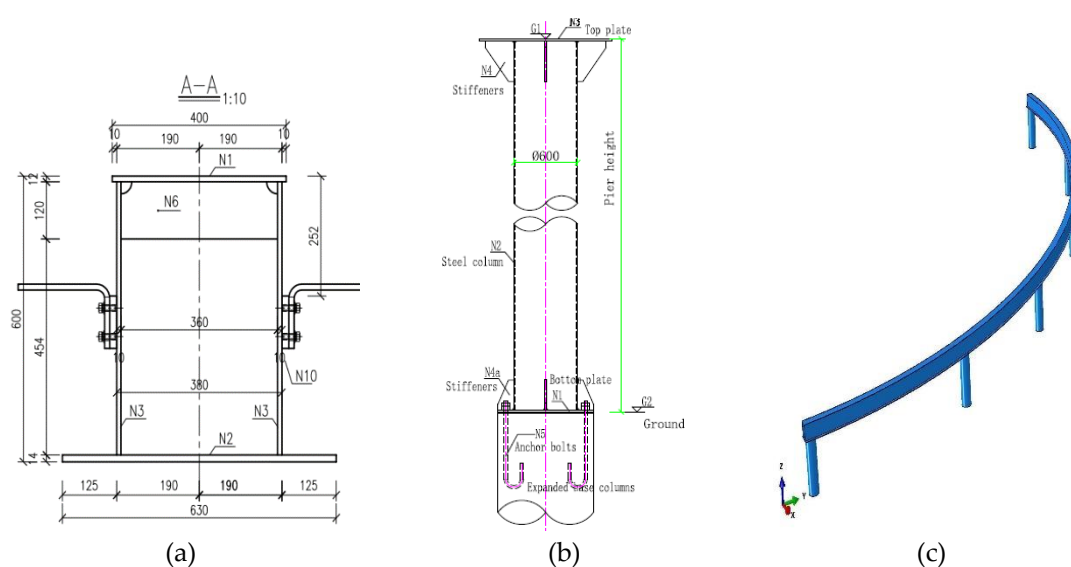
Representative design diagrams and numerical model of monorail substructures. (a) Cross-section of the track beam; (b) design diagram of the pier; (c) finite element model.
